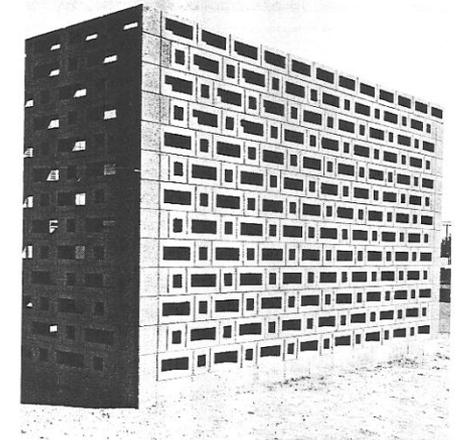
Screen wall enclosing a refuse area. Note the neat corners.
